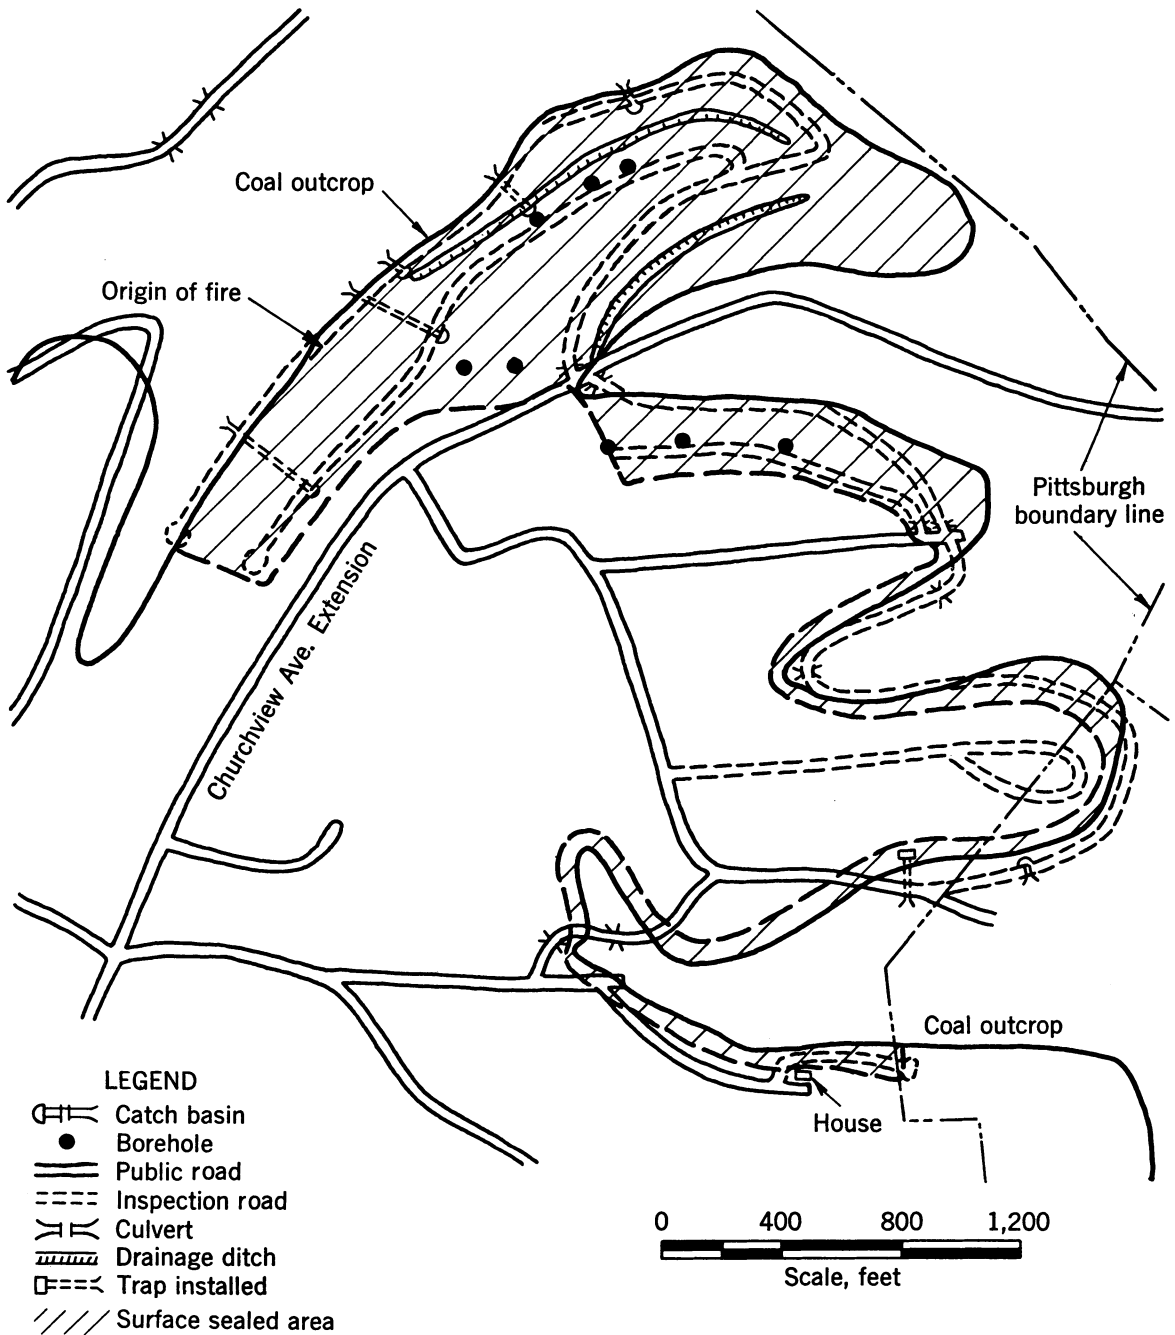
Map Showing Inspection Roads, Drainways, Culverts, Boreholes, and Trap Installed on Churchview Avenue Extension Fire-Control Project.
